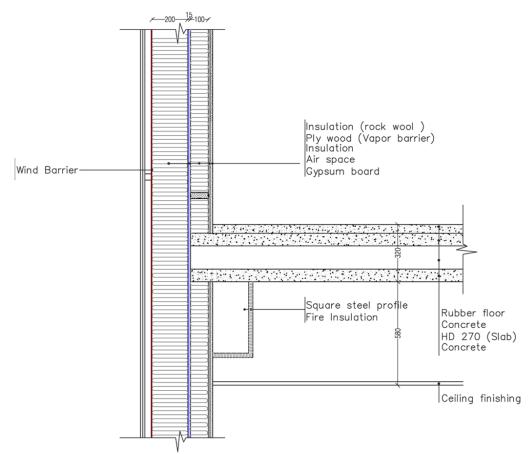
Cross section showing the structural system and the thermal insulation and wind barrier of the exterior walls. Illustration: Shabnam Arbab.
